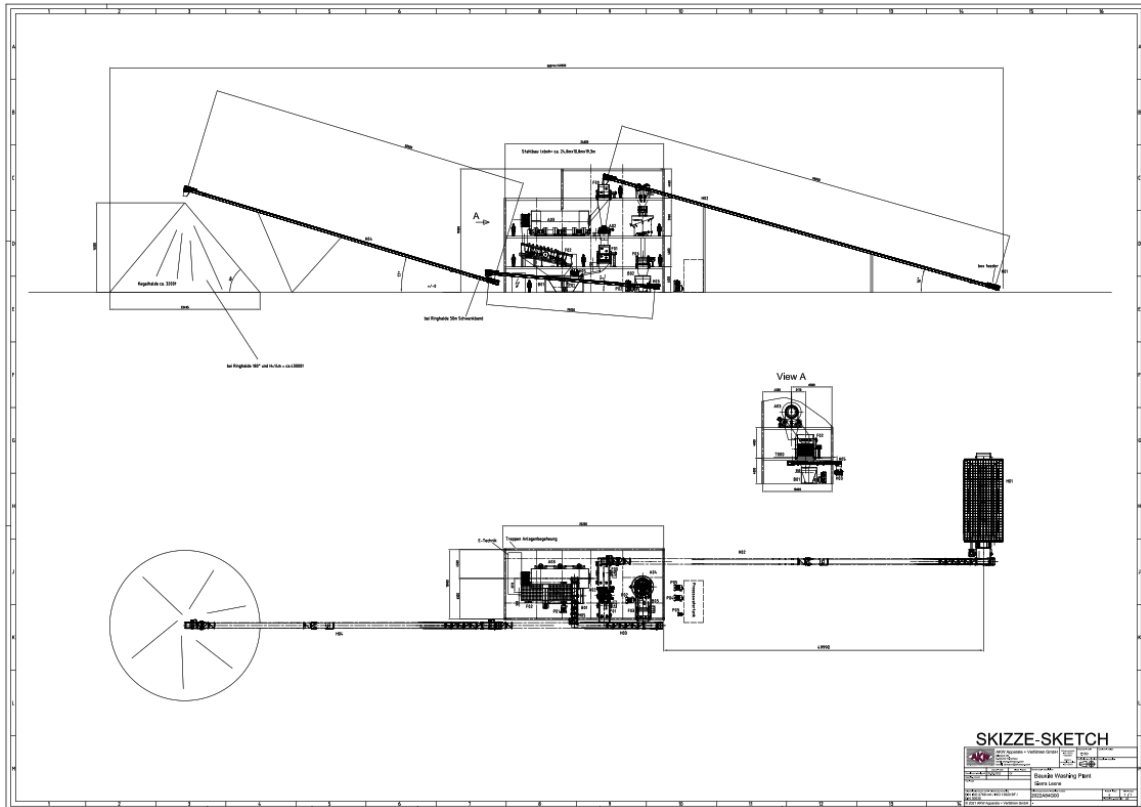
Illustrative process plant lay out – GA drawing example (excerpt from an engineering package by AKW Equipment + Process Design).
